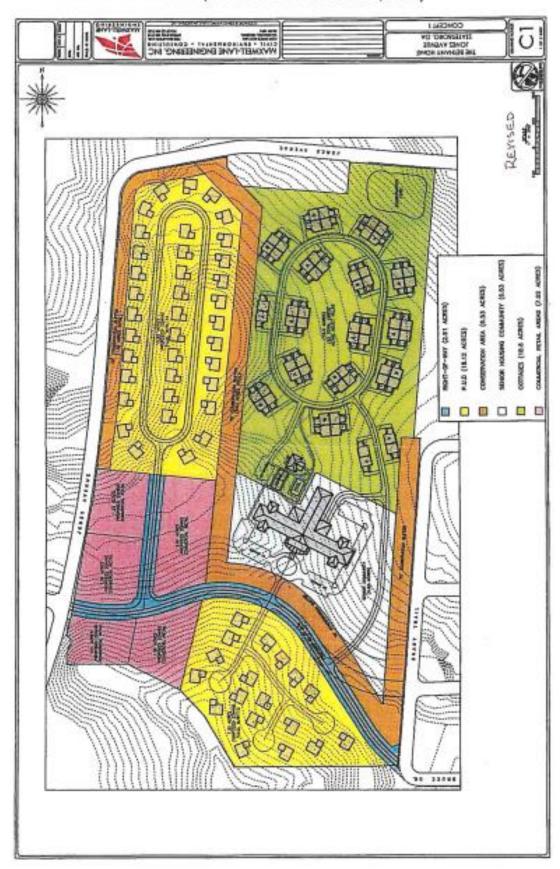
Approved Site Plan & Current 2010 Approved Site Plan (continued)
